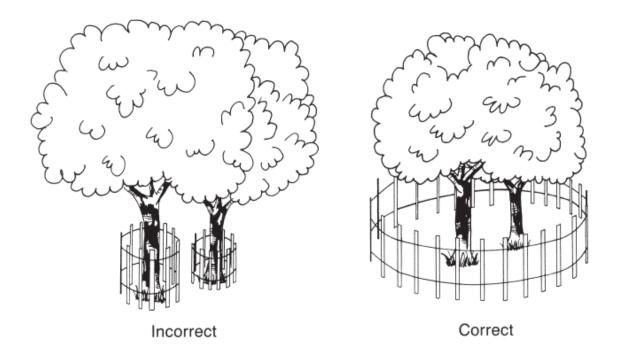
Construction barriers should be installed at the drip line of the tree branches.
